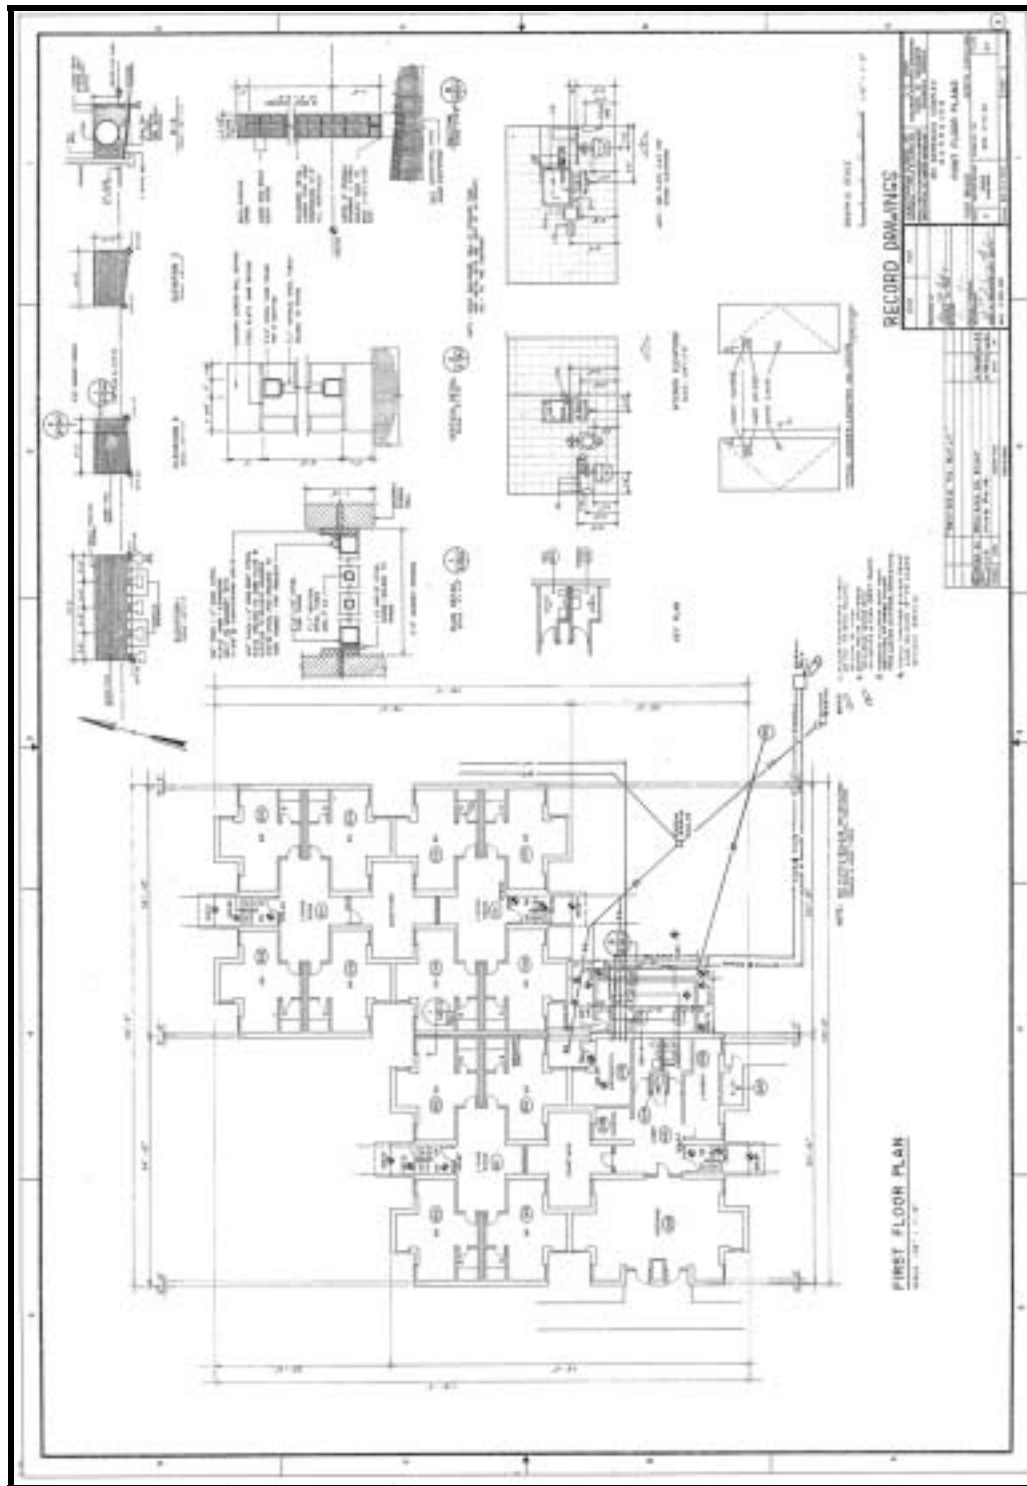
Two-building LBC&W barracks, first floor plan, Ft. Bragg (1981, revised 1982) (Engineering, Ft. Bragg).
